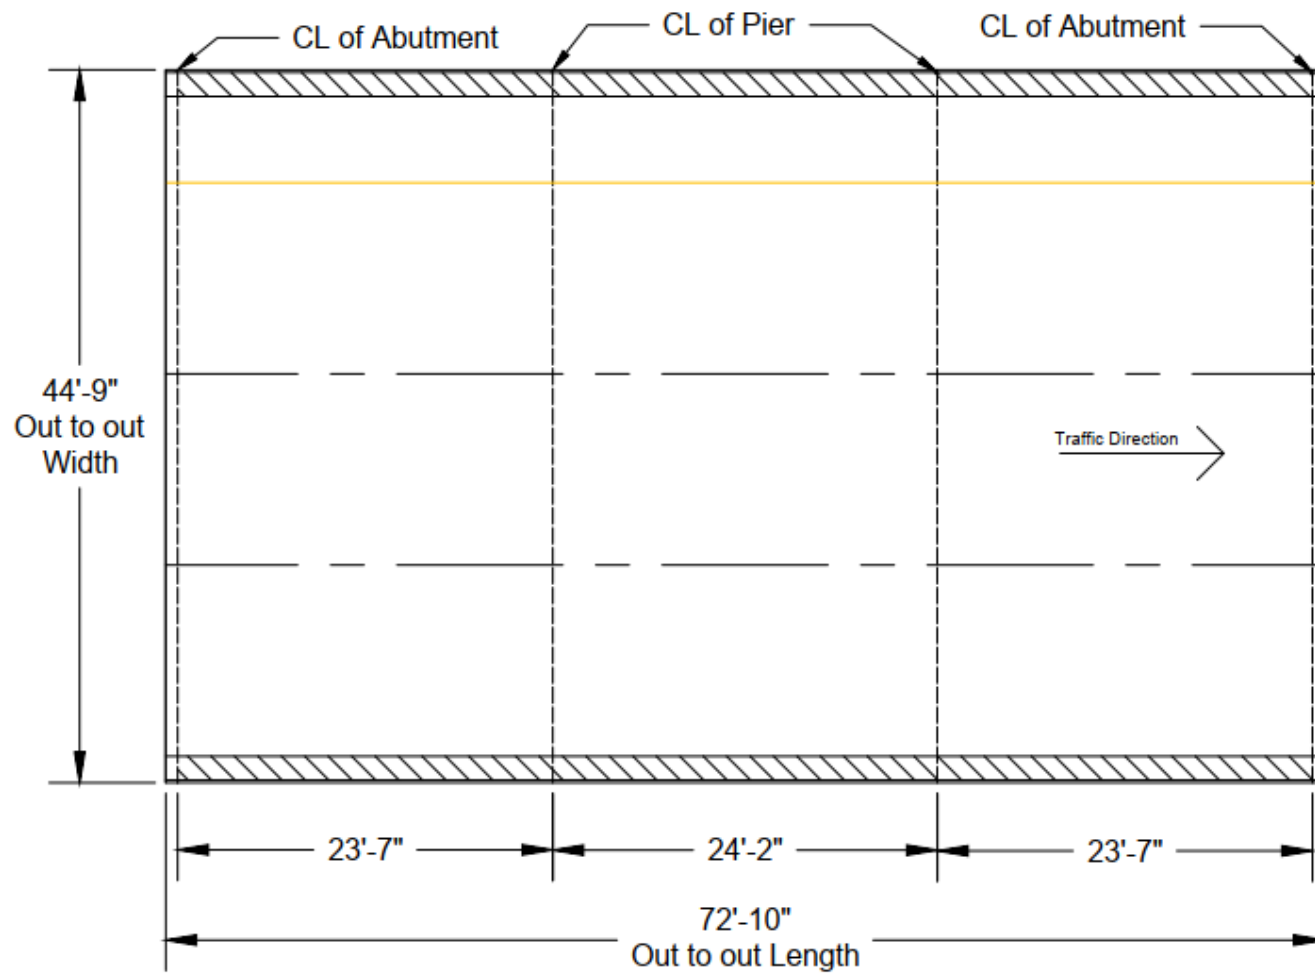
Plan view of the primary slab-span bridge (Bridge 27926).
